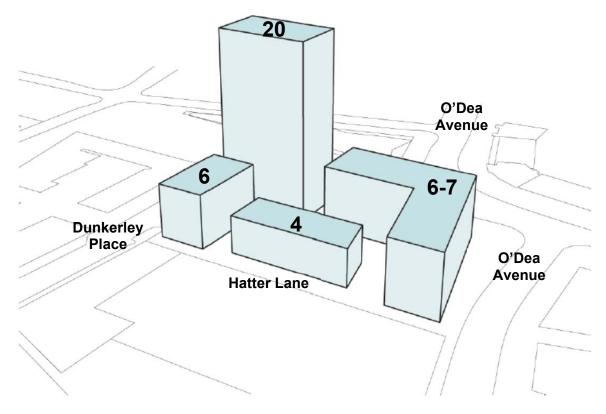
Preferred building envelopes and maximum height in storeys as per Lachlan DCP.
